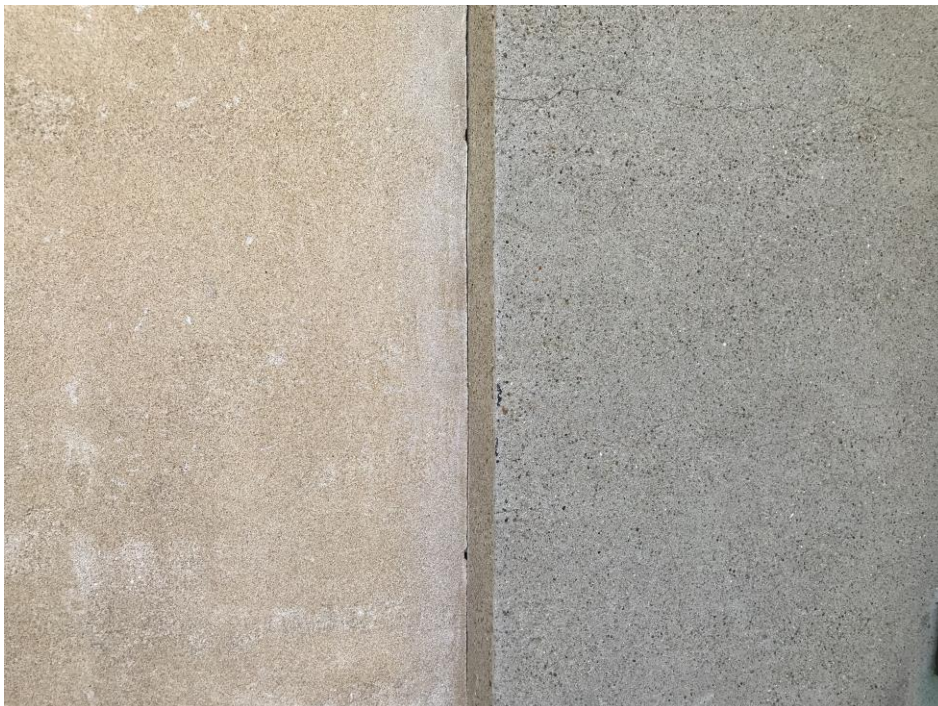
Loggia stucco cladding (left) and north side addition stucco cladding (right).
